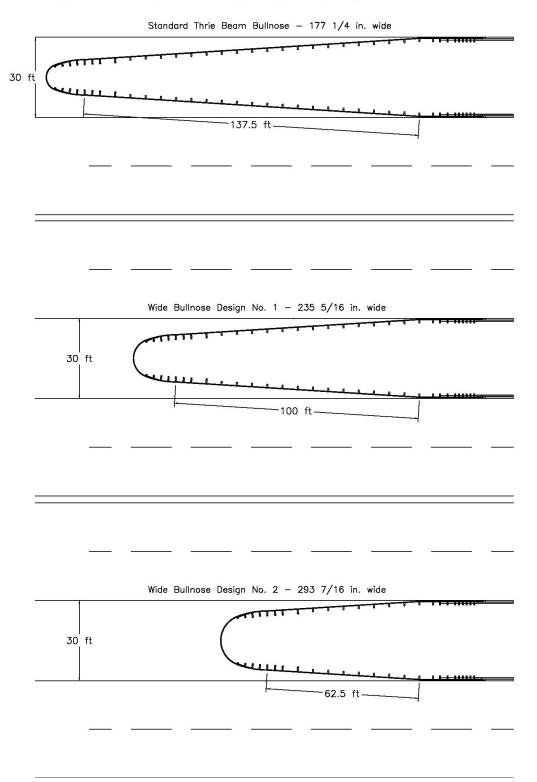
Example of Flared Thrie-Beam Bullnose at Twin Bridge Installations
